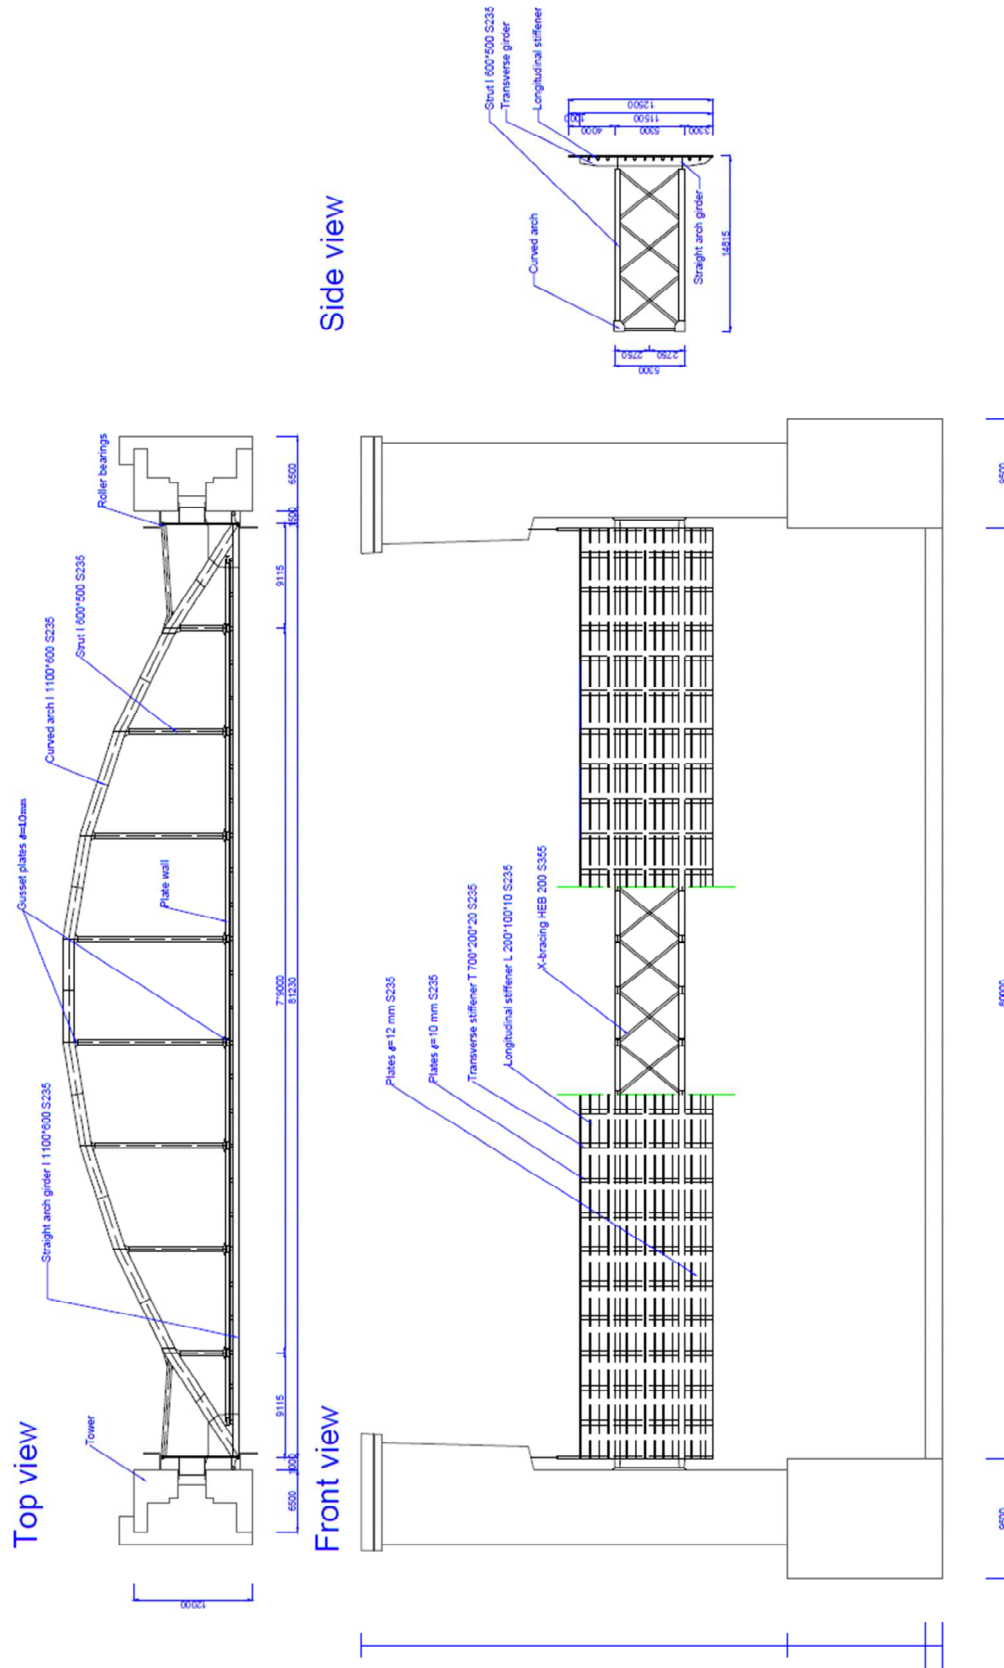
Technical drawing storm surge barrier Hollandsche IJssel (dimension mm)
